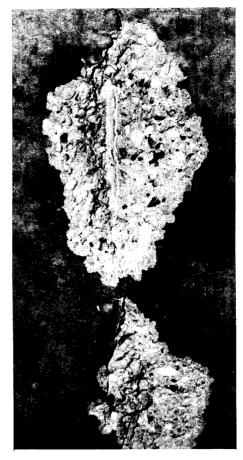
Concrete spalled by corroding aluminum conduit (from Ref. 5).
